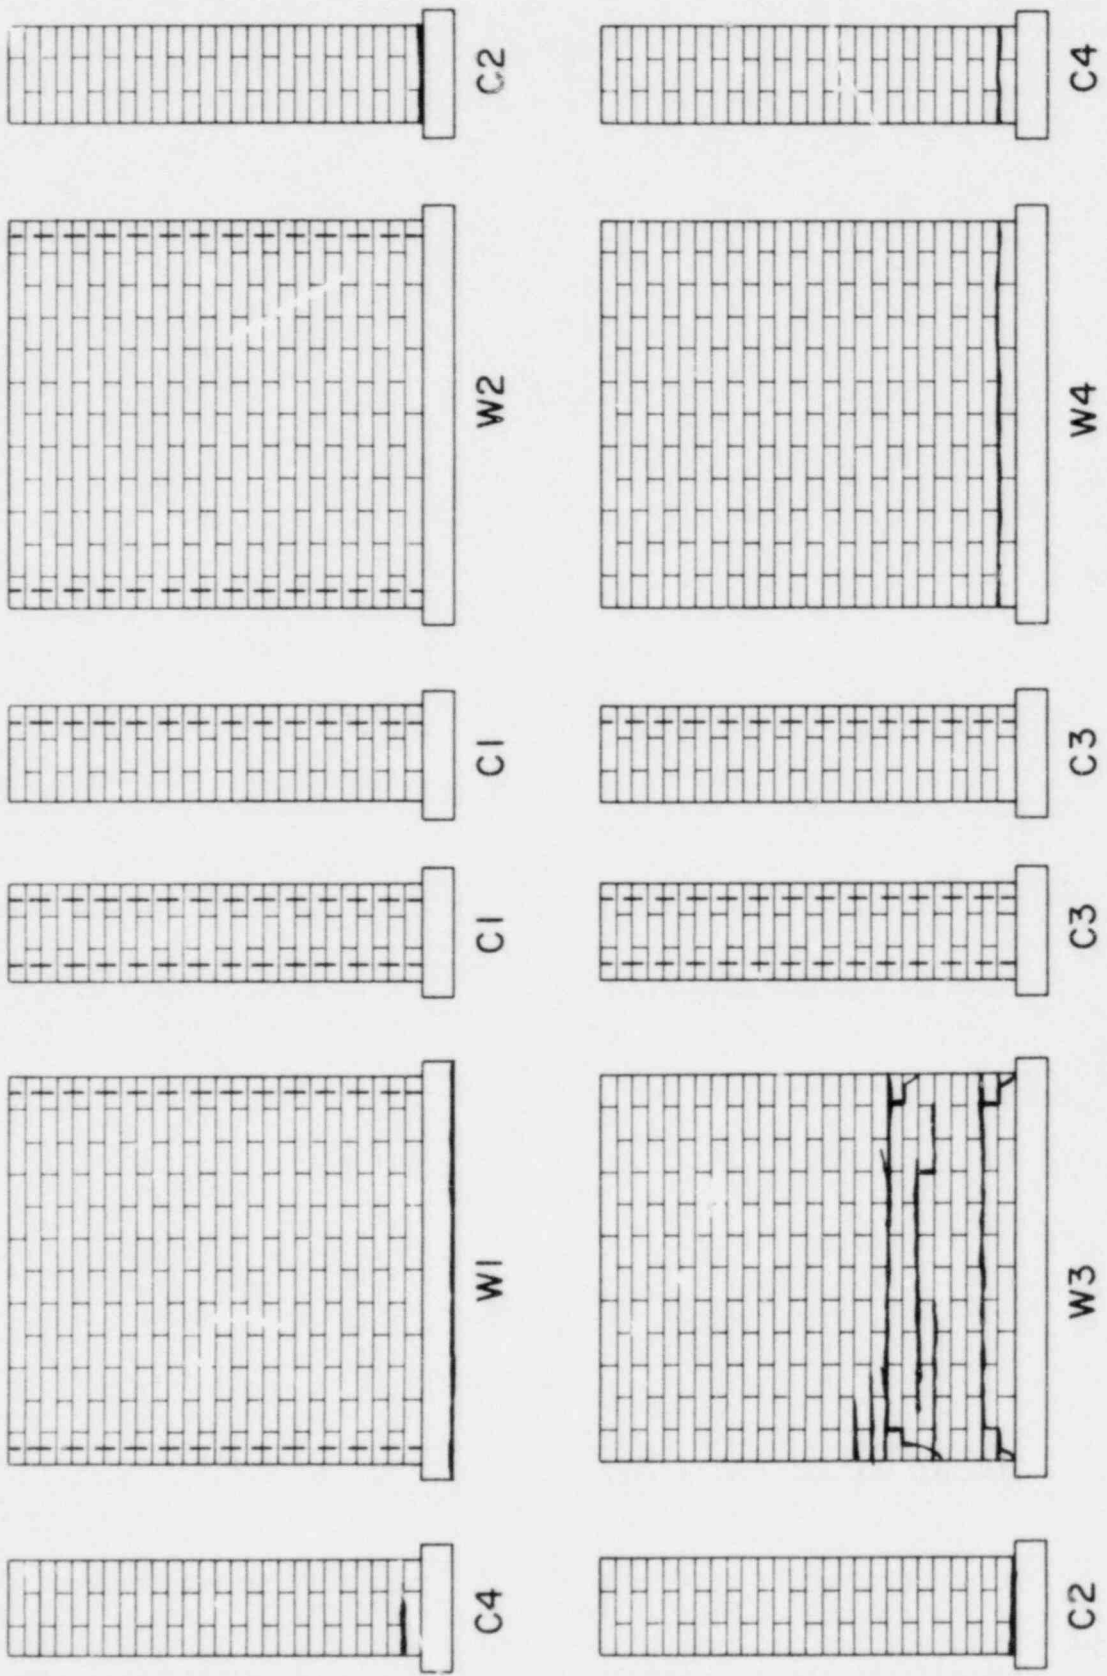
(e) DISTRIBUTION OF CRACKS IN THE MASONRY COMPONENTS: HOUSE 1, AFTER TEST 13
